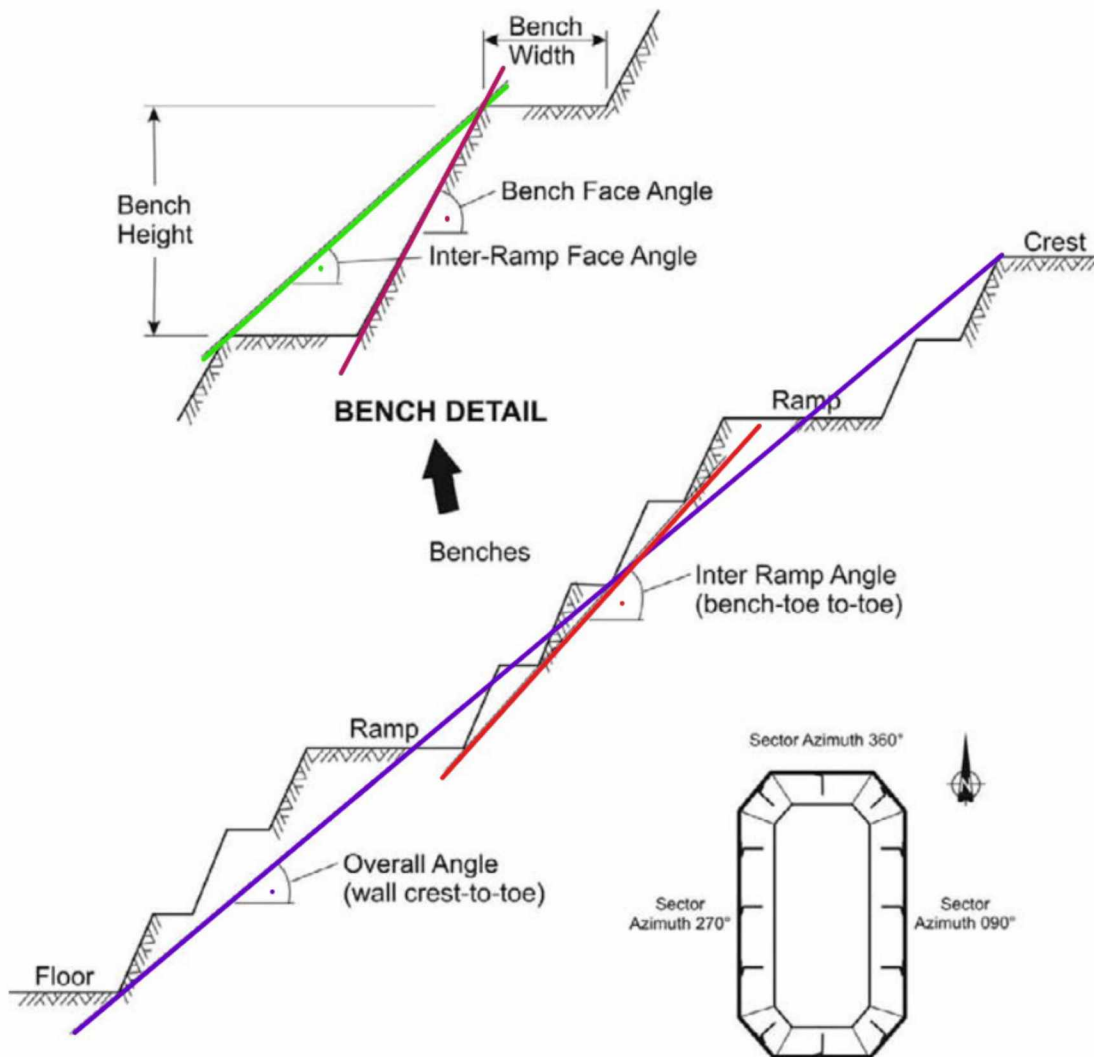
5 Pit wall terminology (Read & Stacey, 2009)
